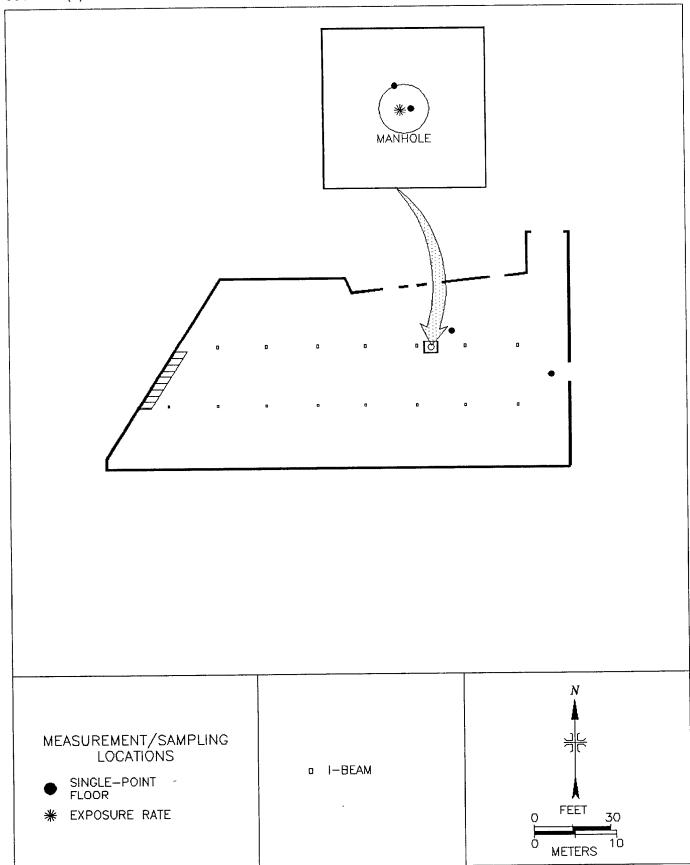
South Building, Area 3A — Measurement and Sampling Locations
